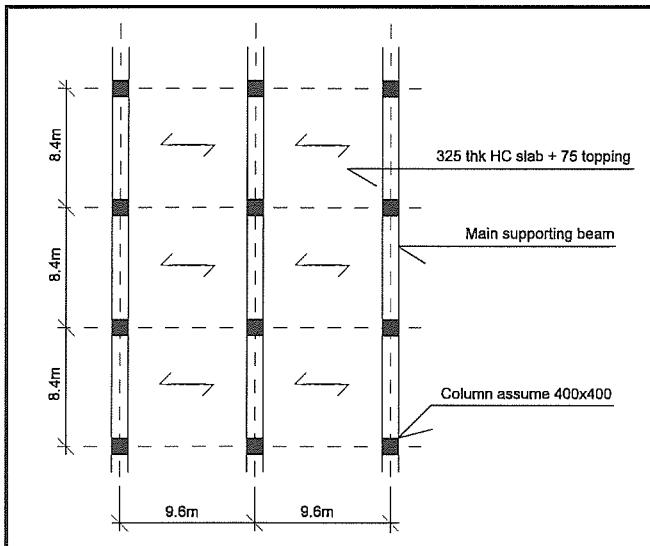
Typical Floor Plan For Precast Beam Design For Design Examples 3 to 6.
